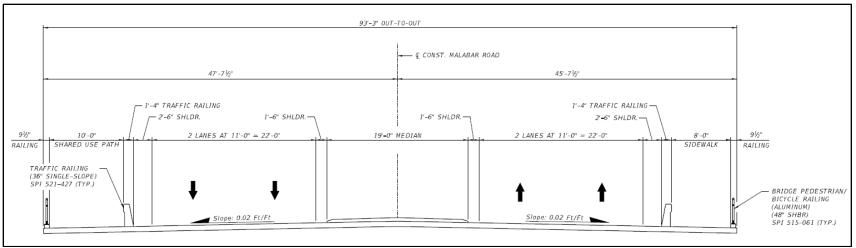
Preferred Alternative Typical Section – Bridge over Canal C-10
